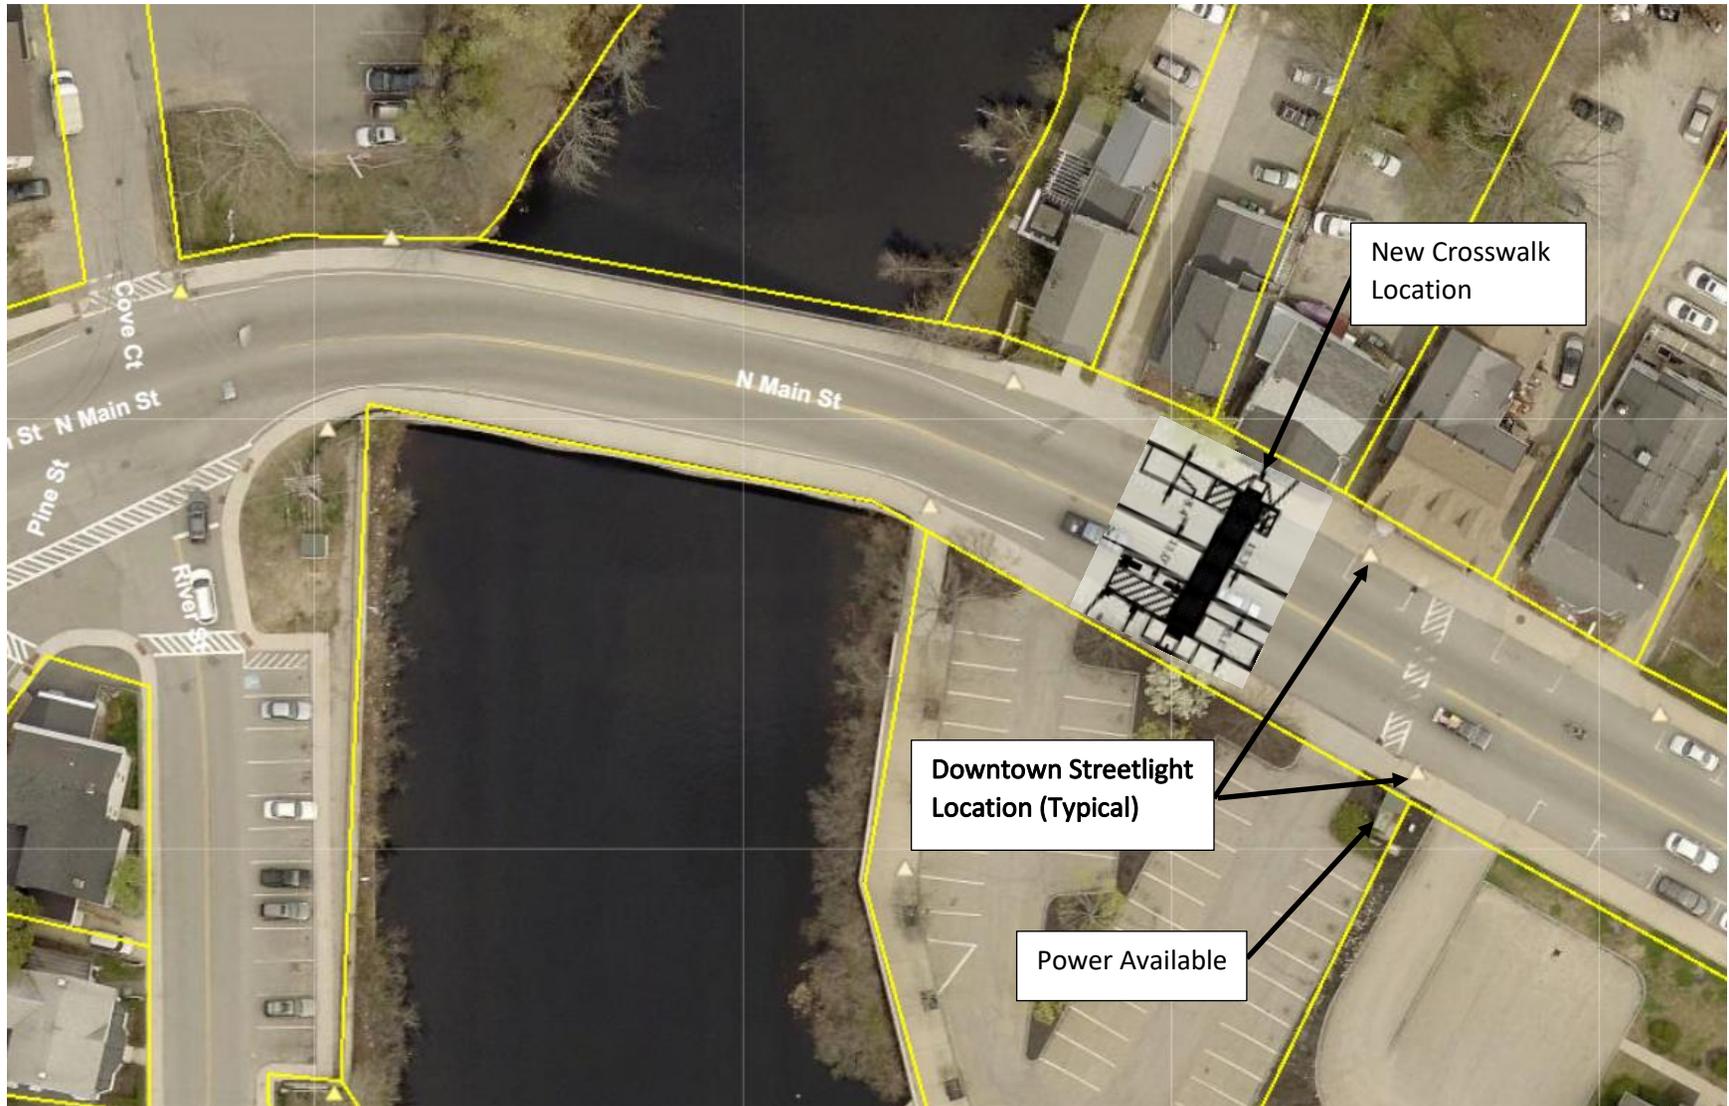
Drawing. New design for midblock crosswalk lighting layout.
